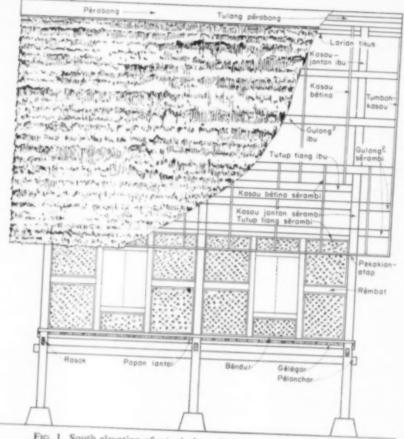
South elevation of a typical small Malay house (Hilton 1956).
